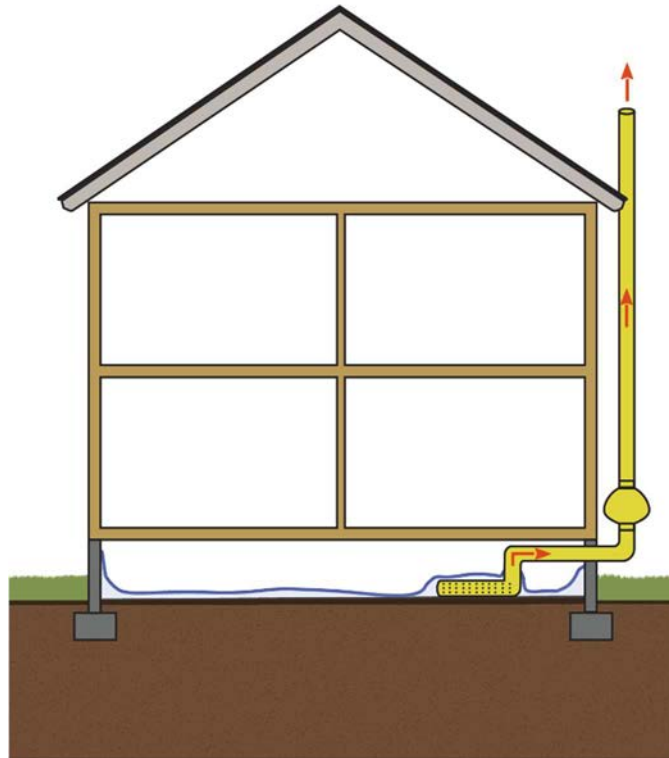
Sub-membrane depressurization with external fan roof level exhaust.
